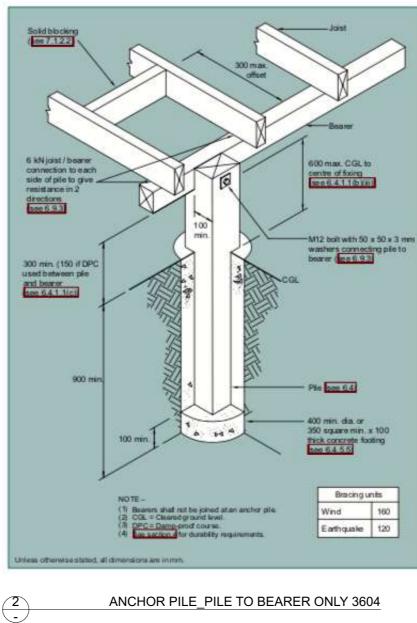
DETAIL IS APPLICABLE FOR RE-JOINING OF HOUSE AS WELL. ALL EXISTING WALL FRAMING TO REMAIN WHERE SUITABLE.
